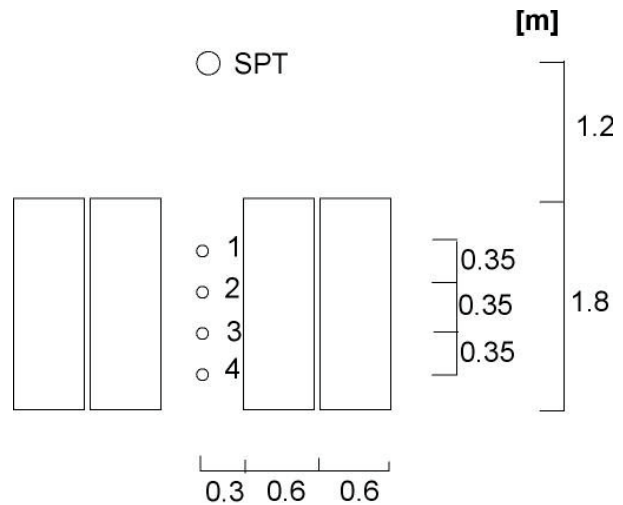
Plan of test site showing location of the four piles, the borehole, and the footprint of the reaction load.
